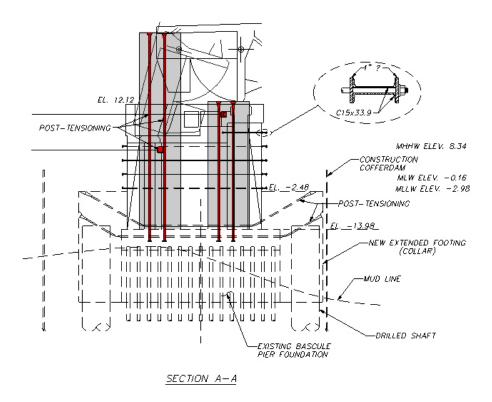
Bascule Pier Wall – Rehabilitation Option 1 (Profile)
